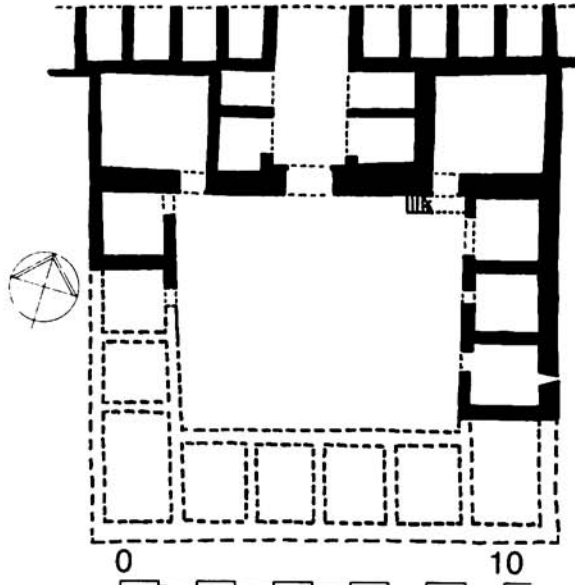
Khān Tankiz: Sketch reconstruction
